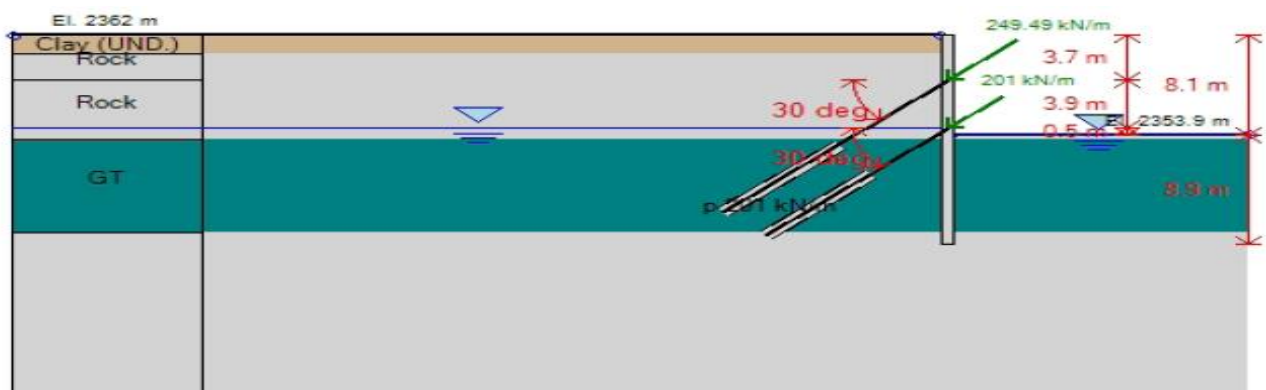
2<sup>nd</sup> level anchor installation for 1.5 m spacing and 1<sup>ST</sup> anchor level 3.7m
